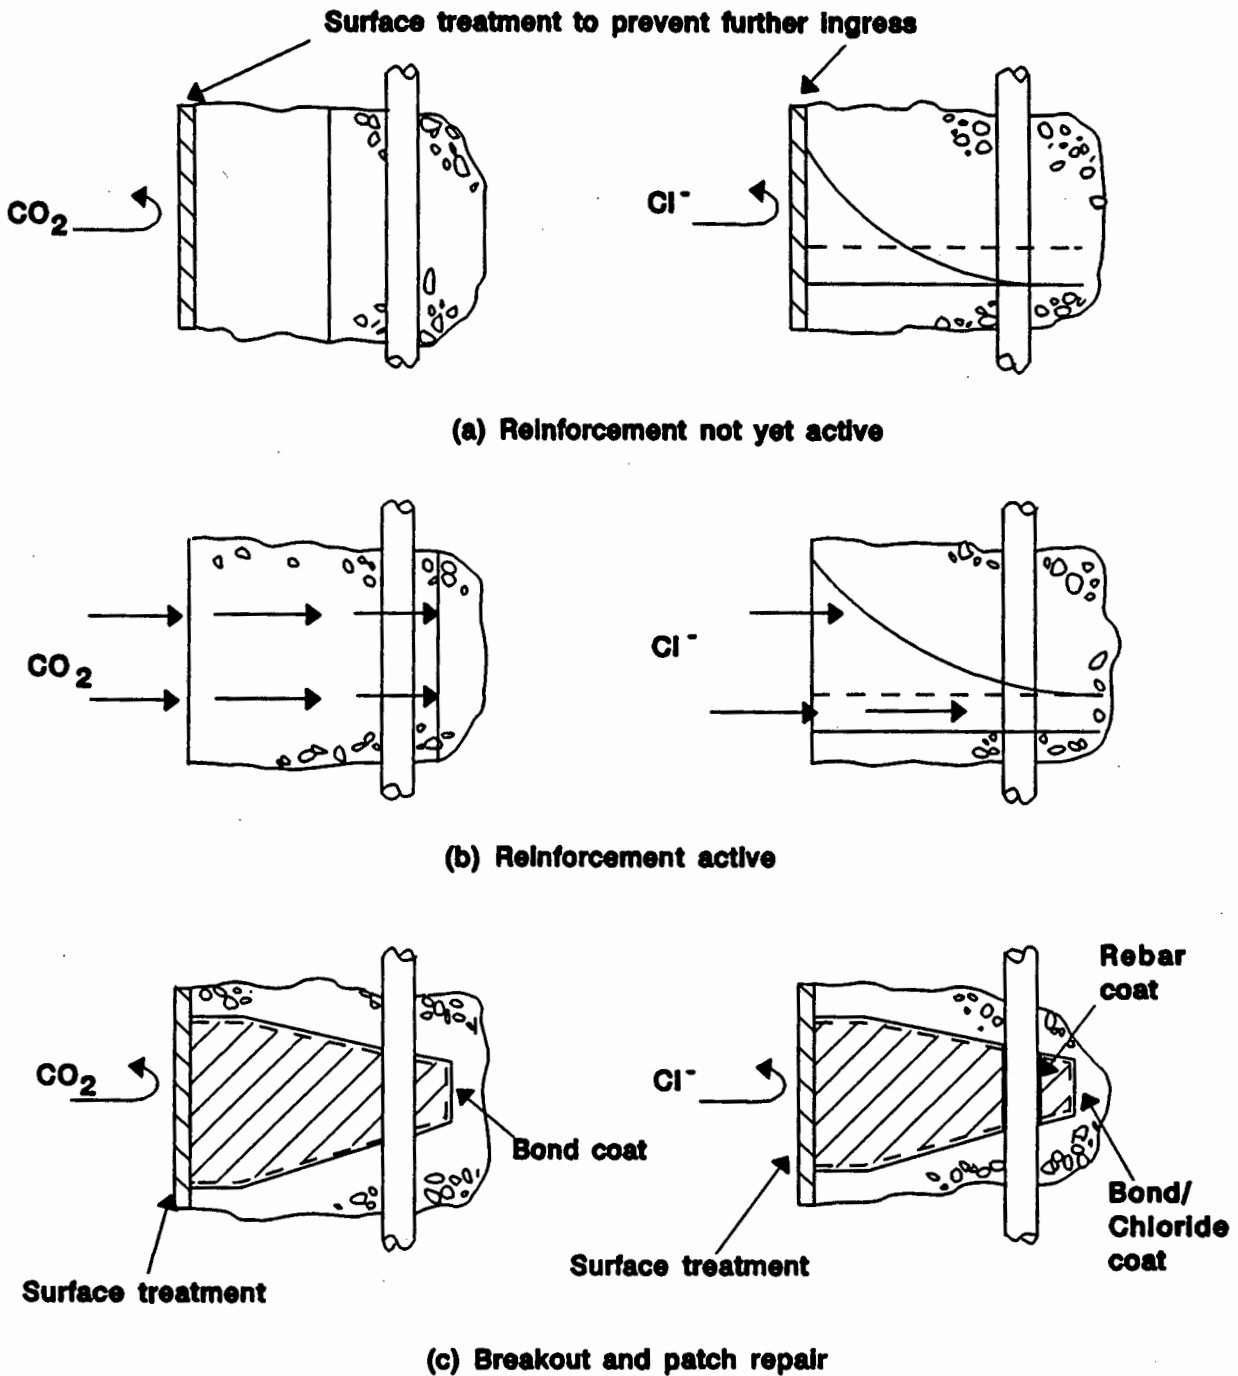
Patch repair of deteriorated reinforced concrete⁽¹²⁾
